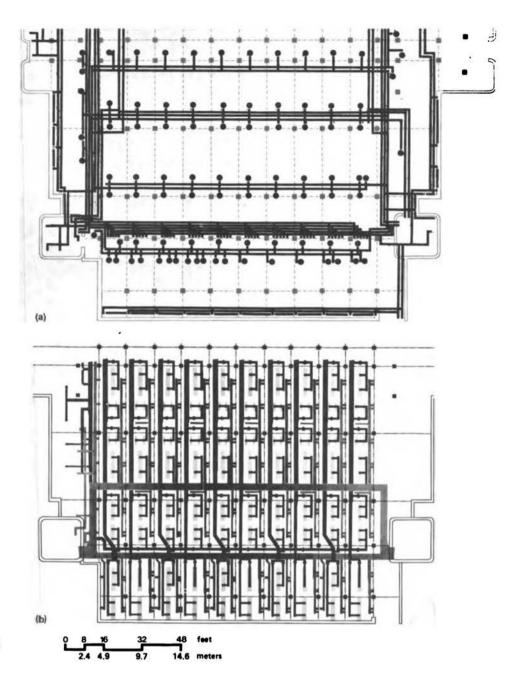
(a) HVAC piping plan; (b) HVAC ductwork plan.
